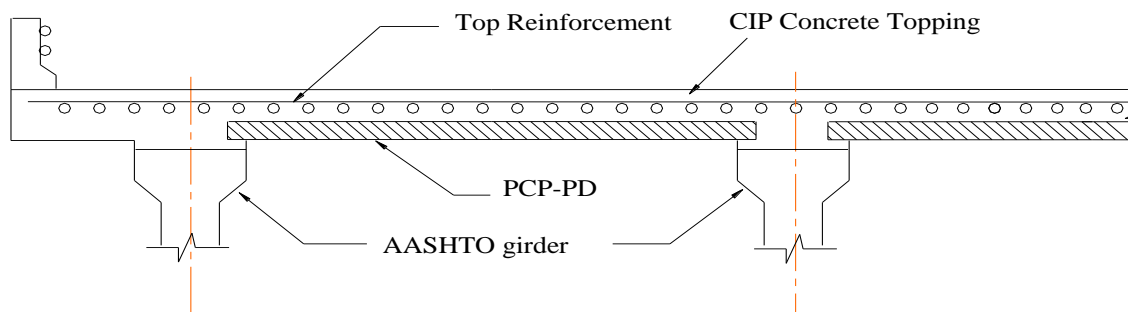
Typical Transverse Section of a PCP-PD Bridge Deck System
